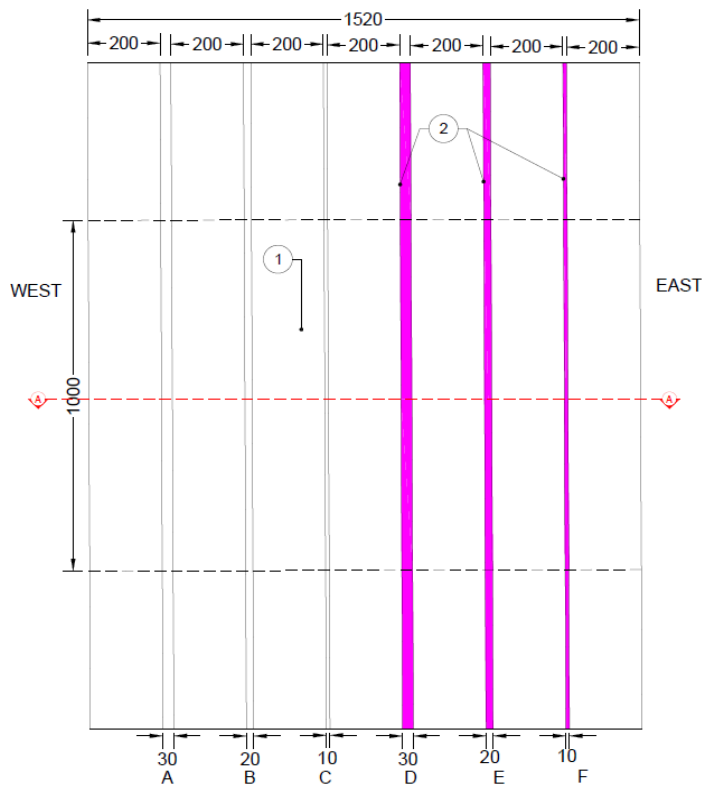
Elevation of test specimen wall and control joints from unexposed side
